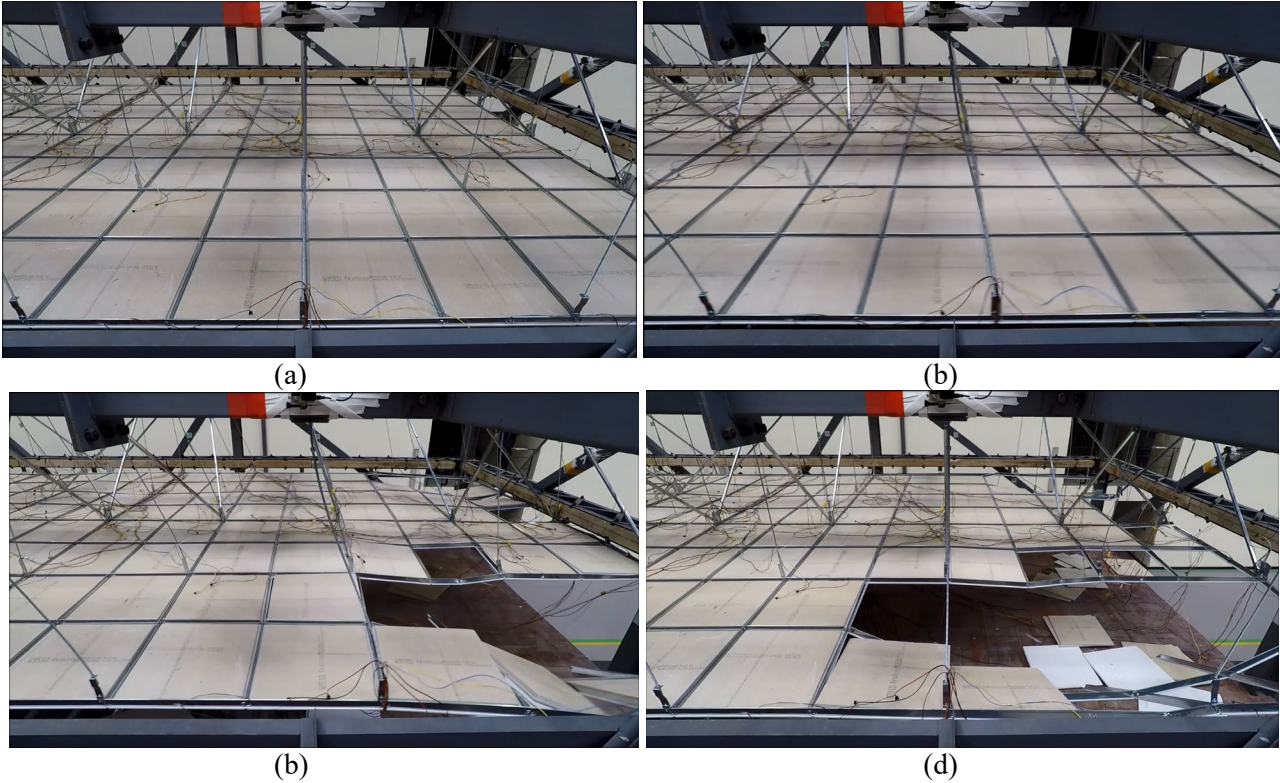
Progress of ceiling damage when vibrated in the Y direction
